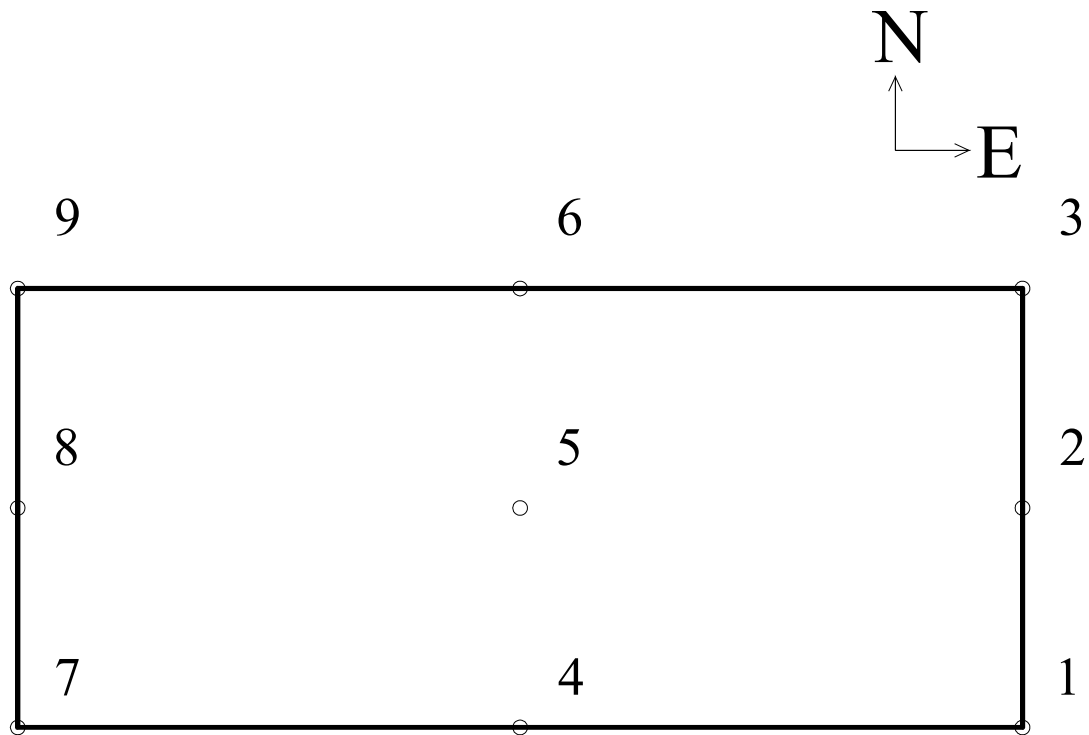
SLAB SPECIMEN POTENTIOMETER LOCATION AND NAMING
